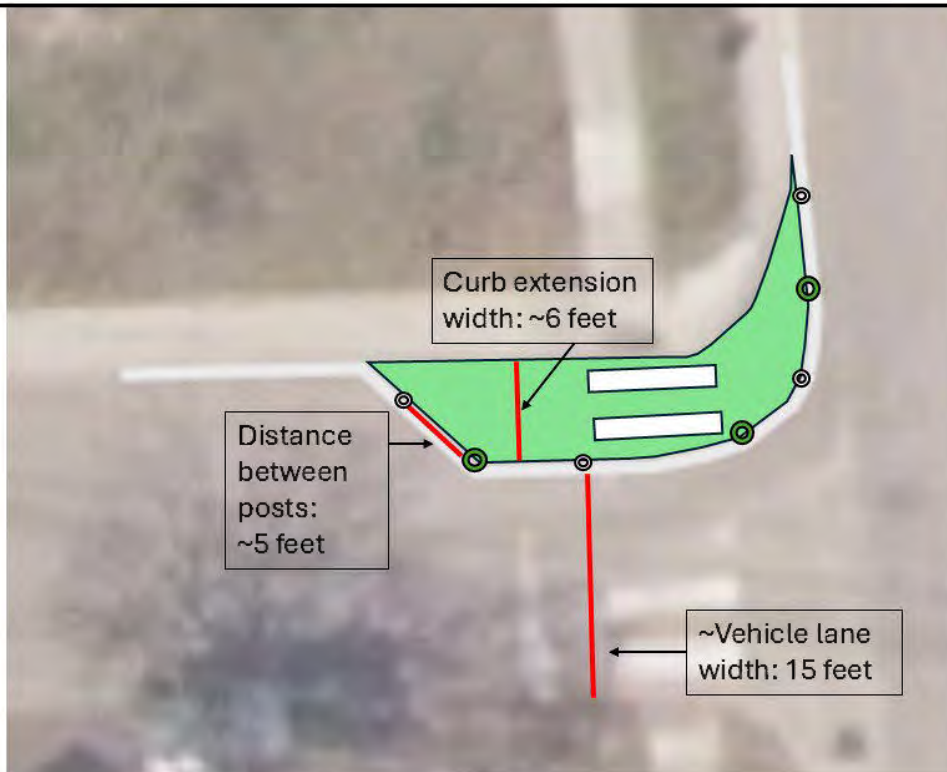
Option 1's installation plan for the intersection of Lincoln Terrace and School Street
